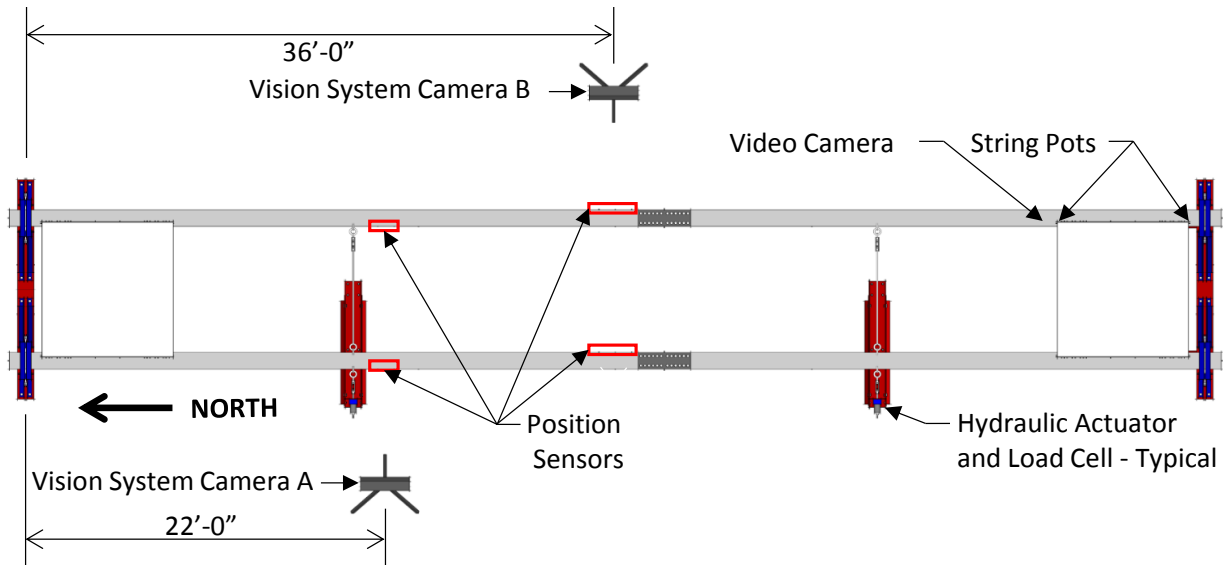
Instrumentation Plan Twin I-Girder Tests – Plan View
